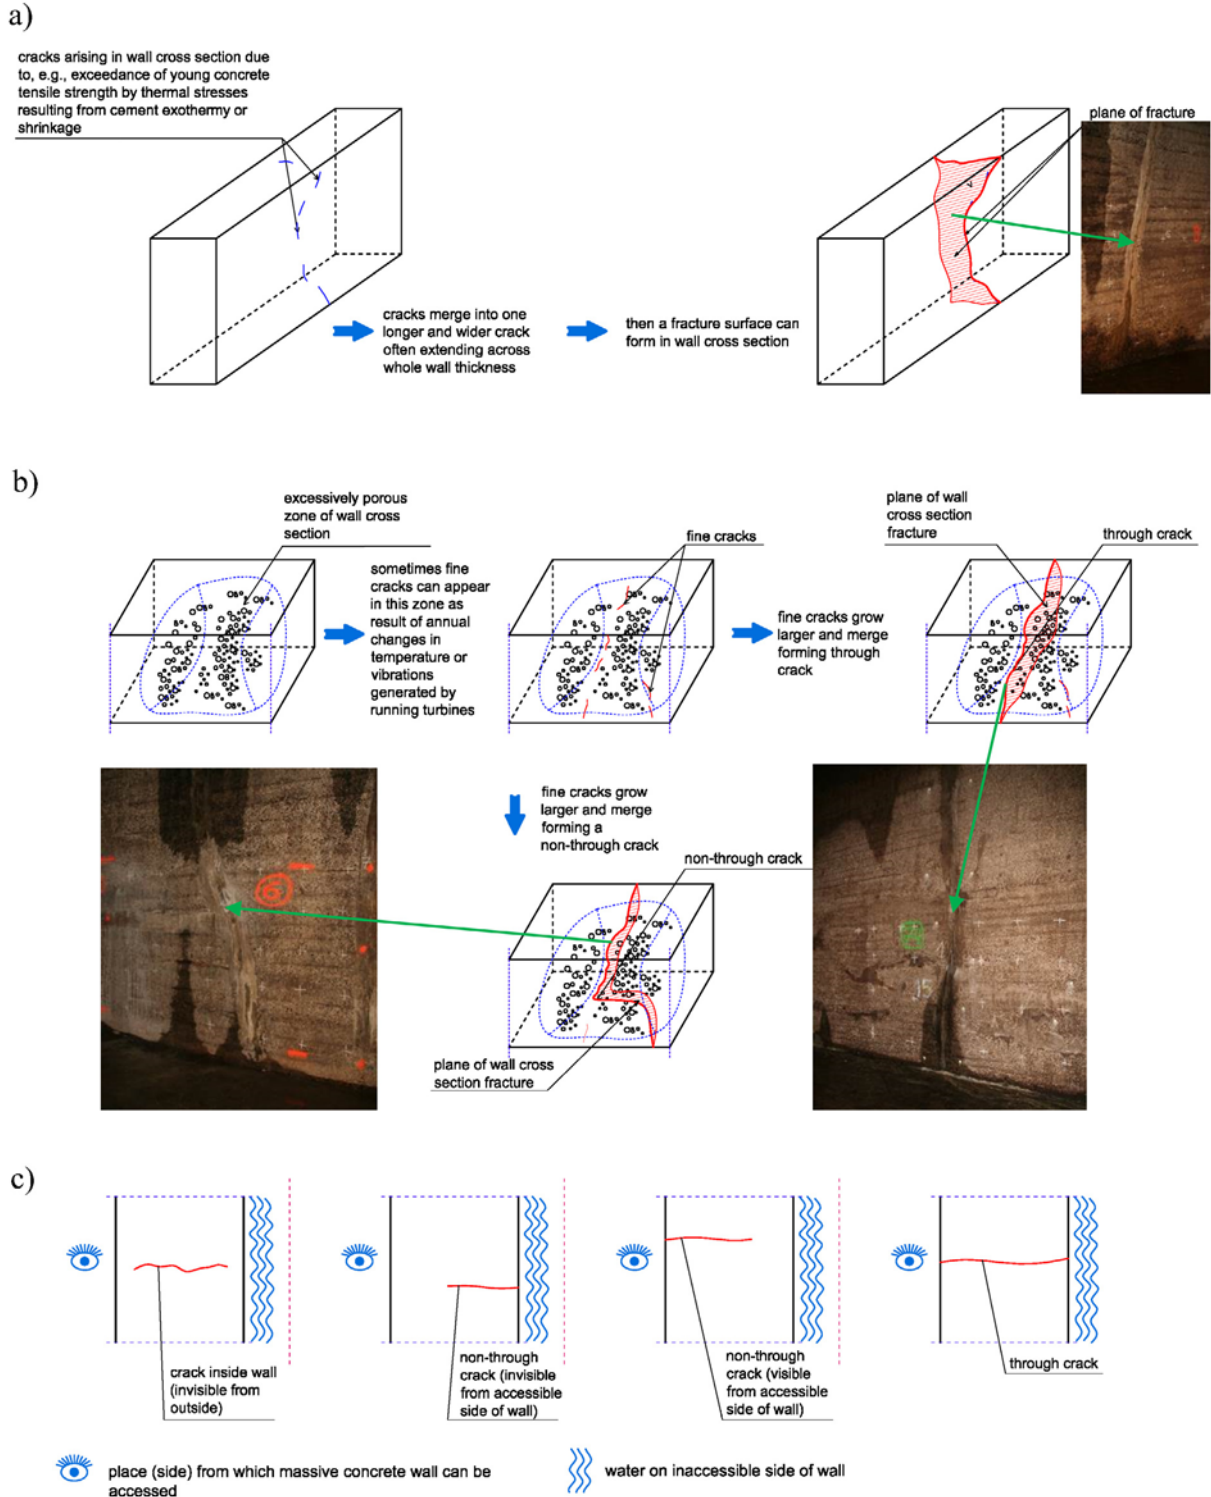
Typical cases when cracks arise in massive concrete walls: (a) at construction stage; (b) during service; (c) possible courses of cracks in wall cross section.
